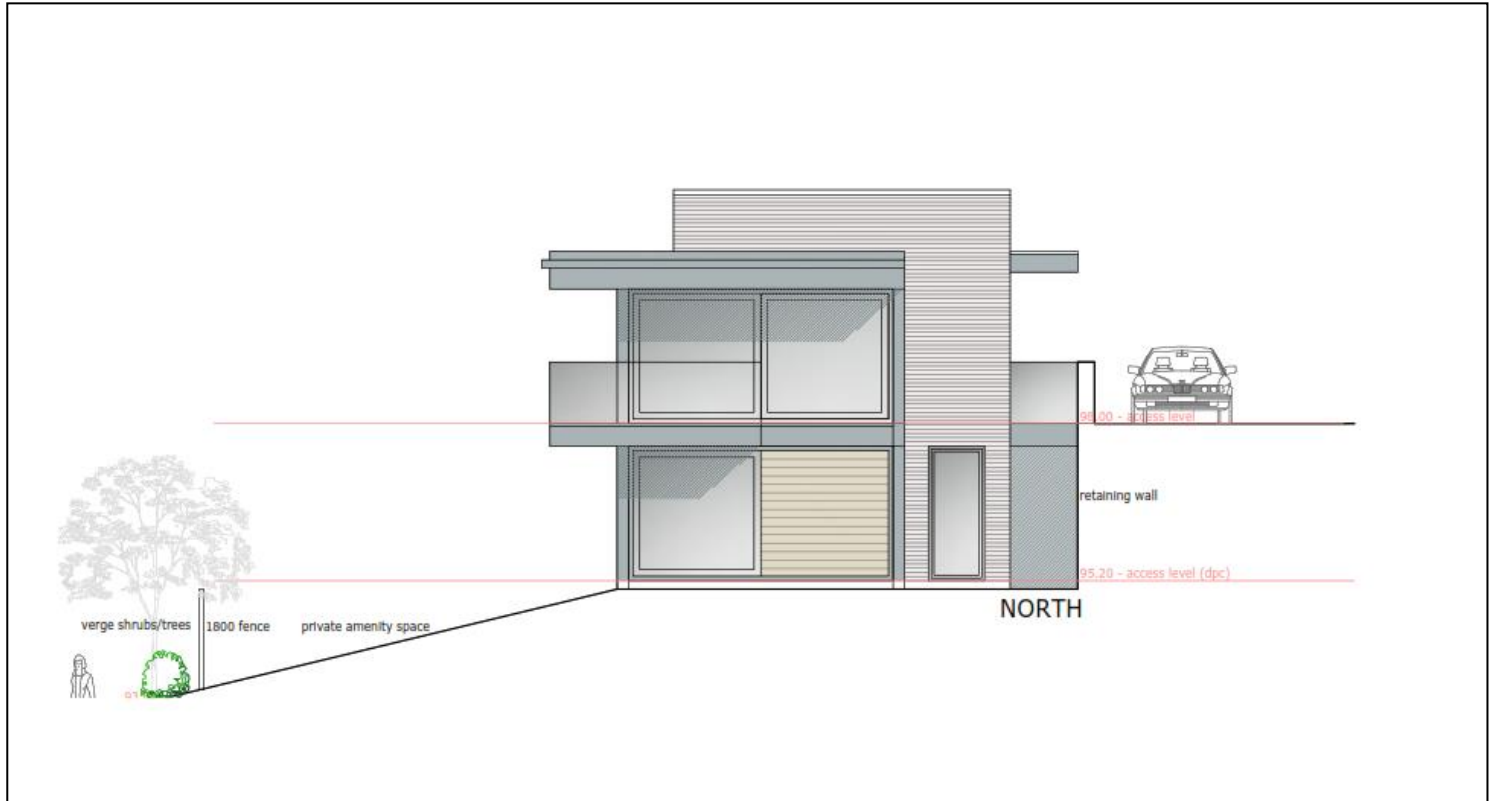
Previously Approved West Elevation (Drawing No: 1921 – 02e))
